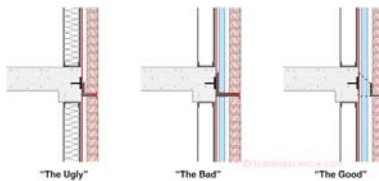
Examples of two poor and good details for metal lintels for supporting a cavity brick wall.
